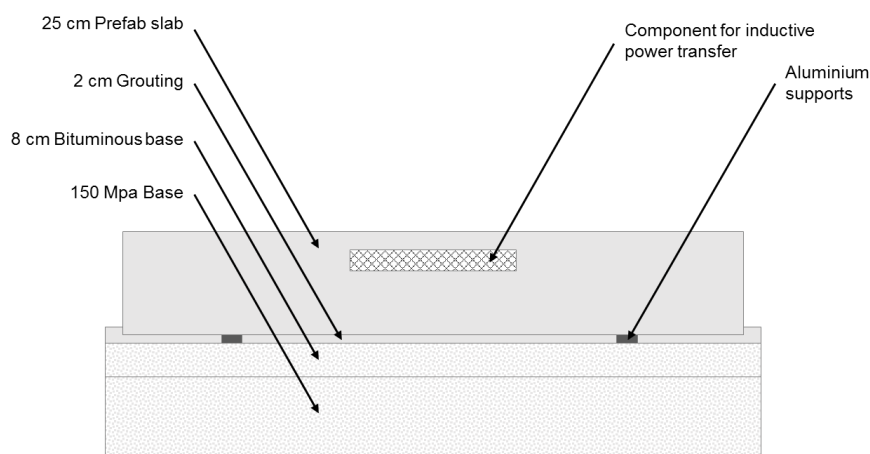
Cross section of PRIMOVE prefabricated slab [27]
